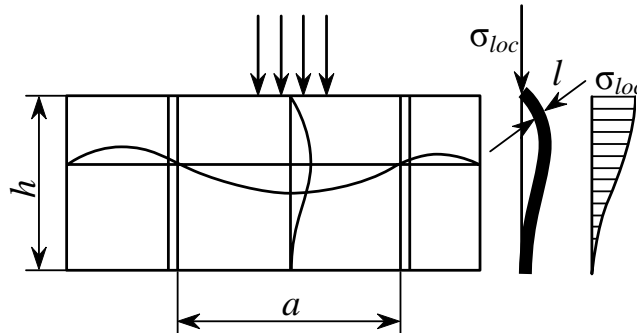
Loss of stability of crane girder web due to local stresses
